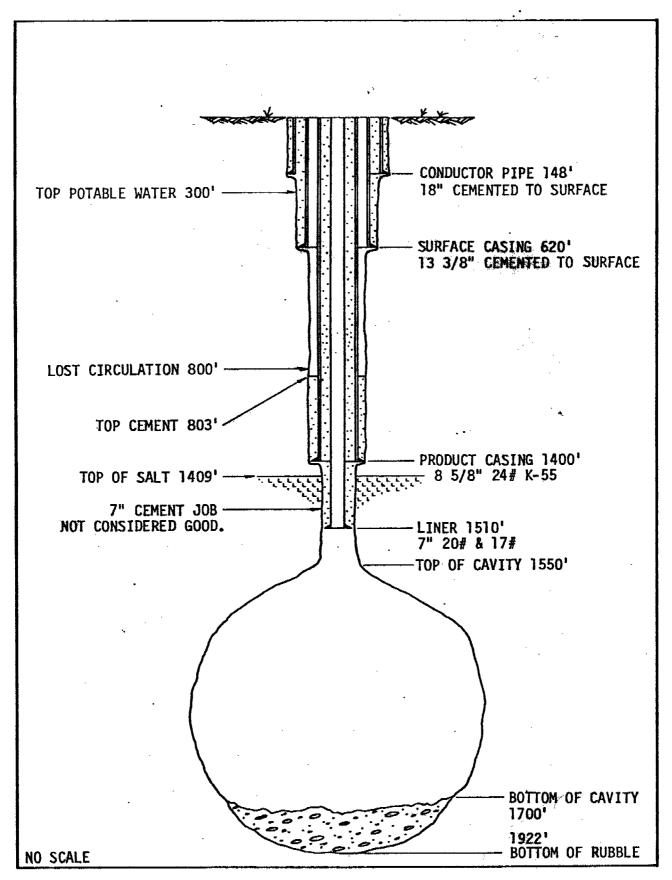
Sketch Showing Present Construction of Storage Well No.1
